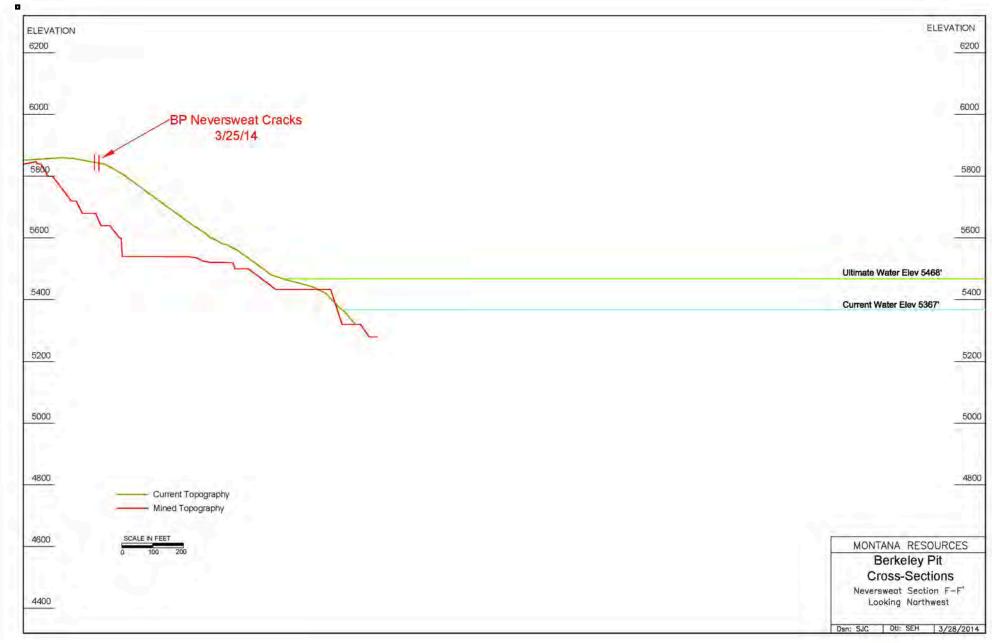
Neversweat Sector cross-section F-F' showing tension cracks and scale of potential slope failure in fill material.
